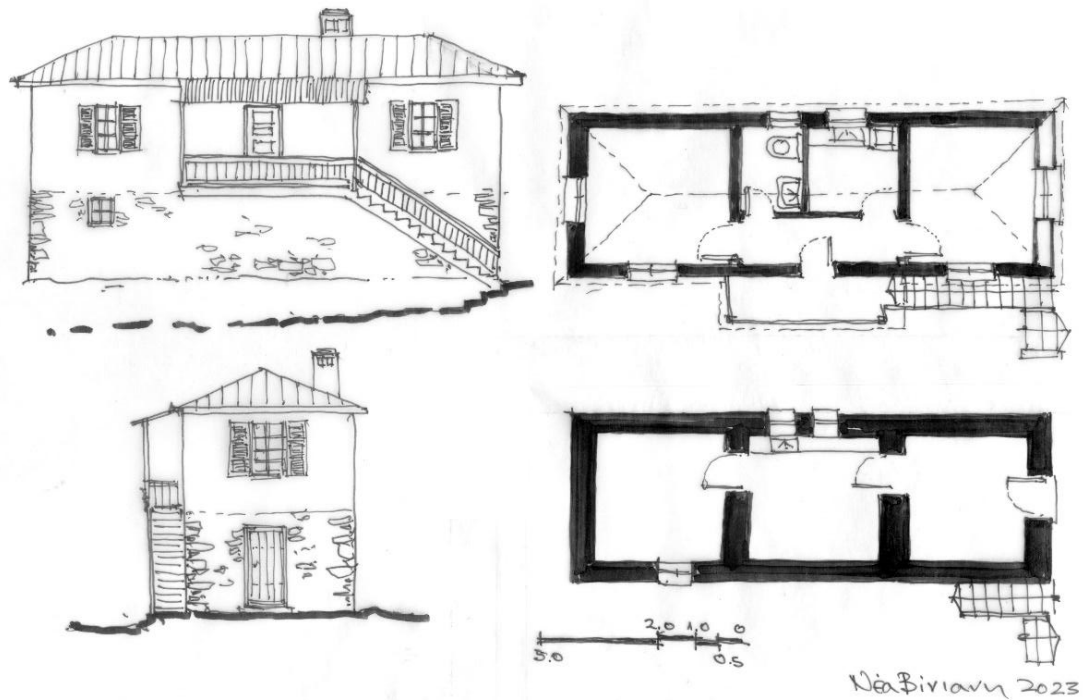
Type of two-story house with three rooms on the ground floor "katogi", one bedroom, kitchen, bathroom, entrance hall, covered balcony and external staircase. Plan and elevations. Nea Viniani. Source: NTUA Research Team, June 2023.
